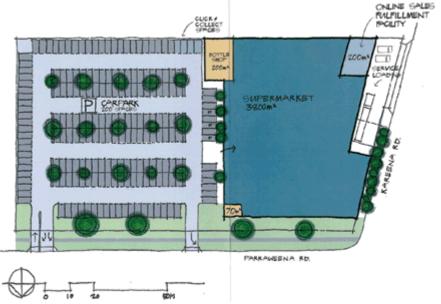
Proposed Woolworths Supermarket: Schematic Plan
